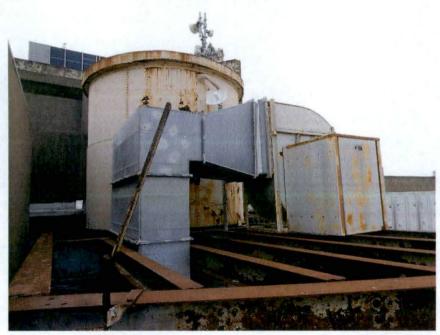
Photo Q: View of water tank and steel structural support members at upper-level roof. Looking south.
